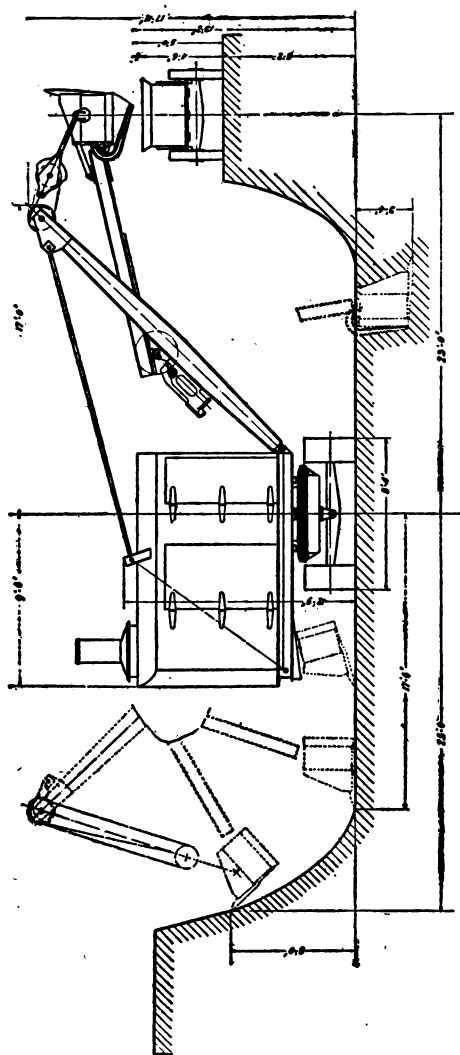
Working Dimensions of Type B, Erie Shovel Made by the Ball Engine Co., Erie, Pa.
